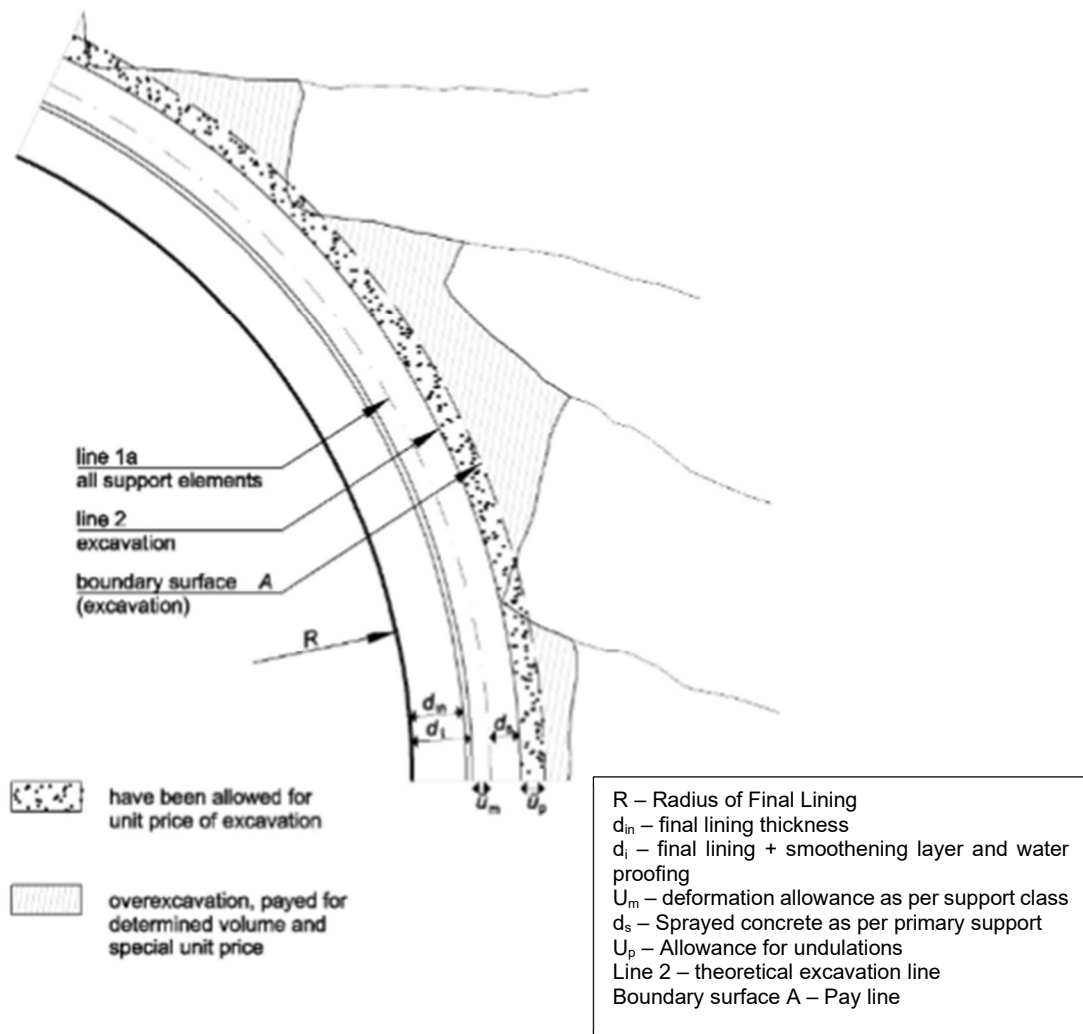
Definition of Payment Lines for Excavation and Sprayed concrete
